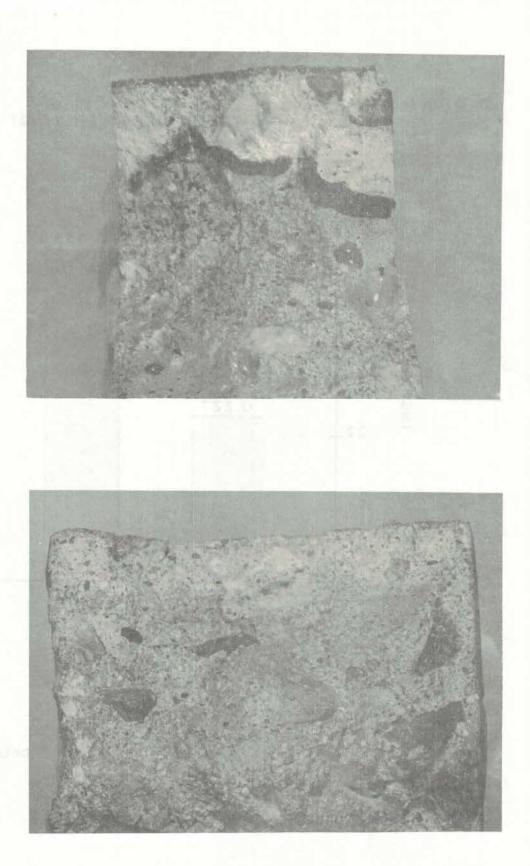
and b. Split Concrete Core From Silane Treated Bridge Deck Shows Penetration Depth (Light colored area at top).
